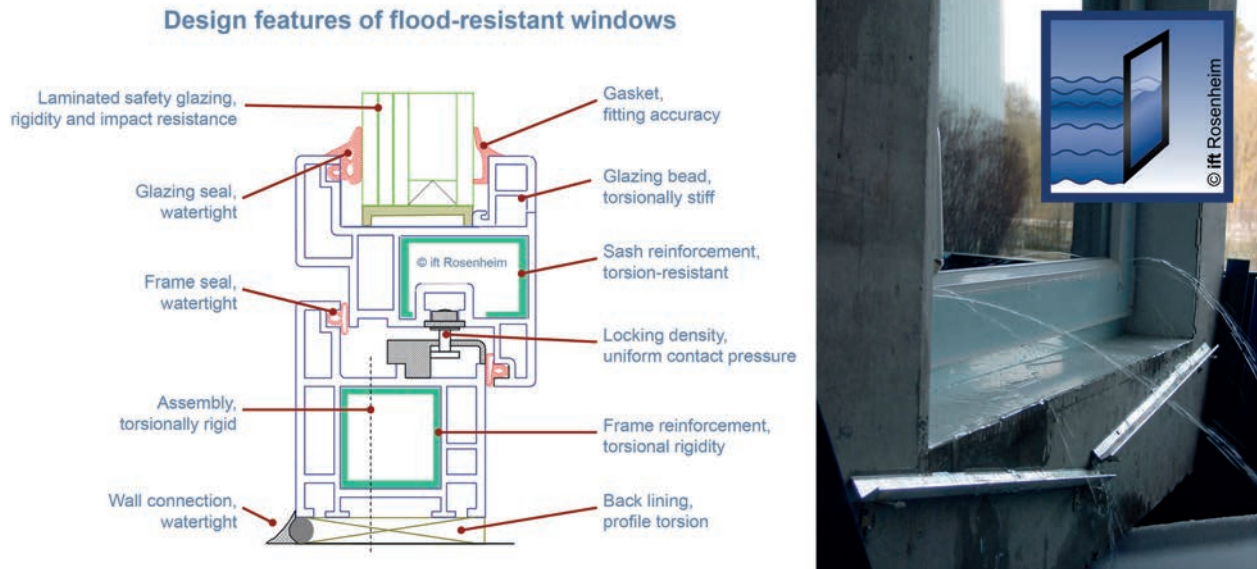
Construction principles and testing of flood-resistant windows [1]
